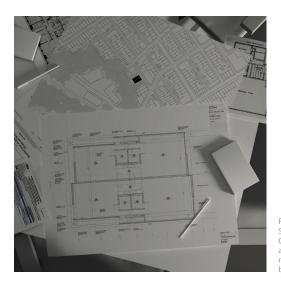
Site Plan and Ground Floor Plan as Shown in the Permit Set. / Rendering by author.
